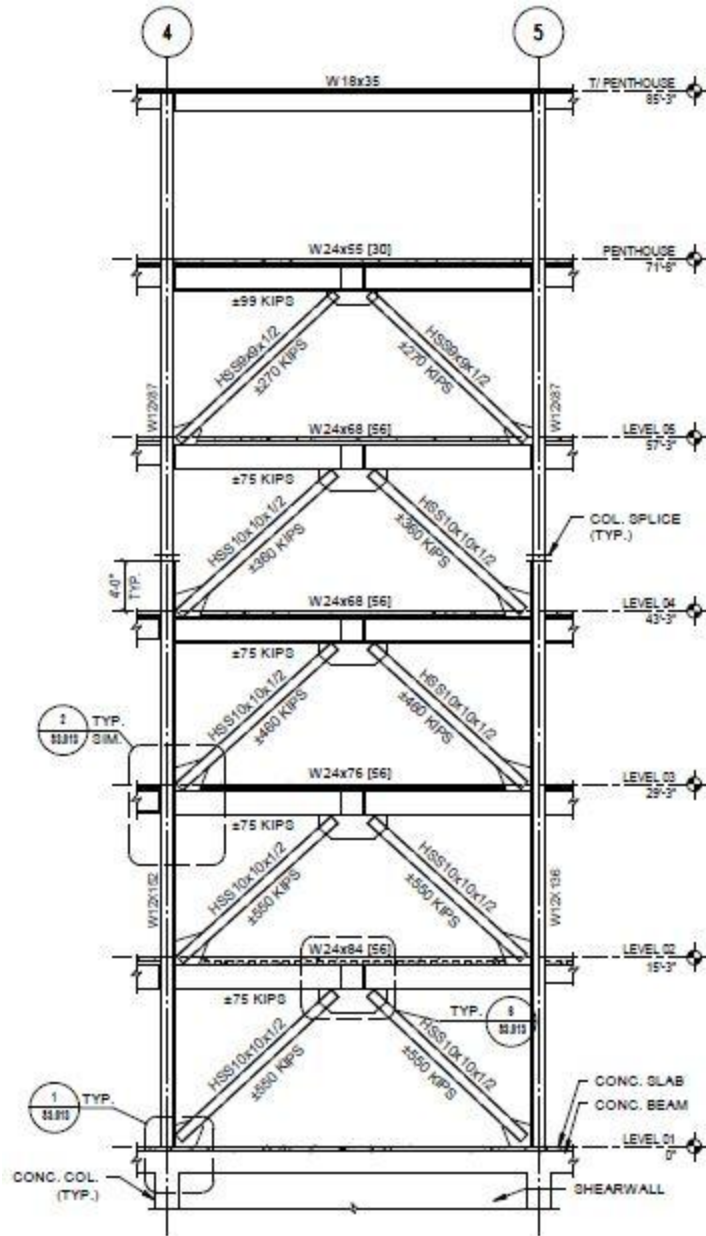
Typical Braced Frame Elevation with Penthouse Support Included
